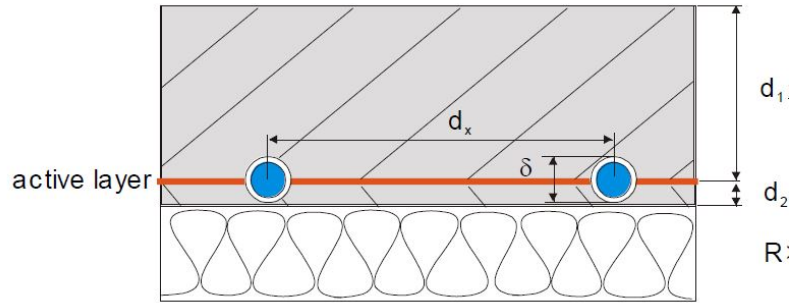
Great Hall floor with an active piping system within the concrete layer and R2.8 insulation base.
